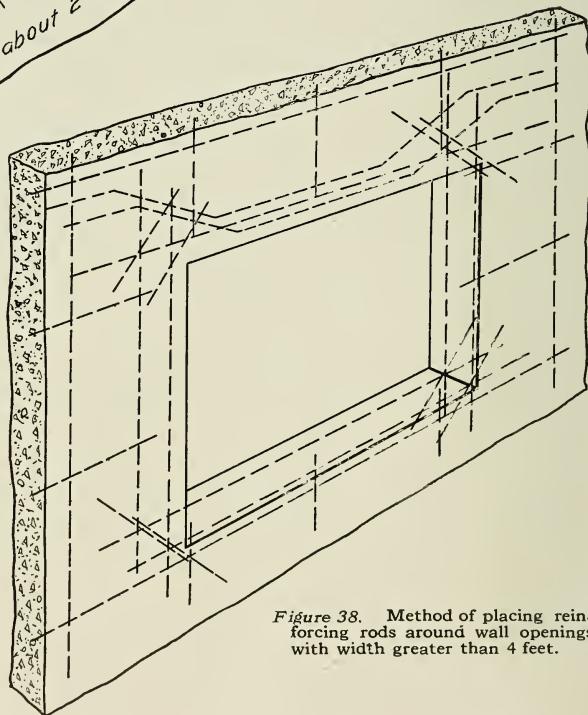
Method of placing reinforcing rods around wall openings with width greater than 4 feet.
